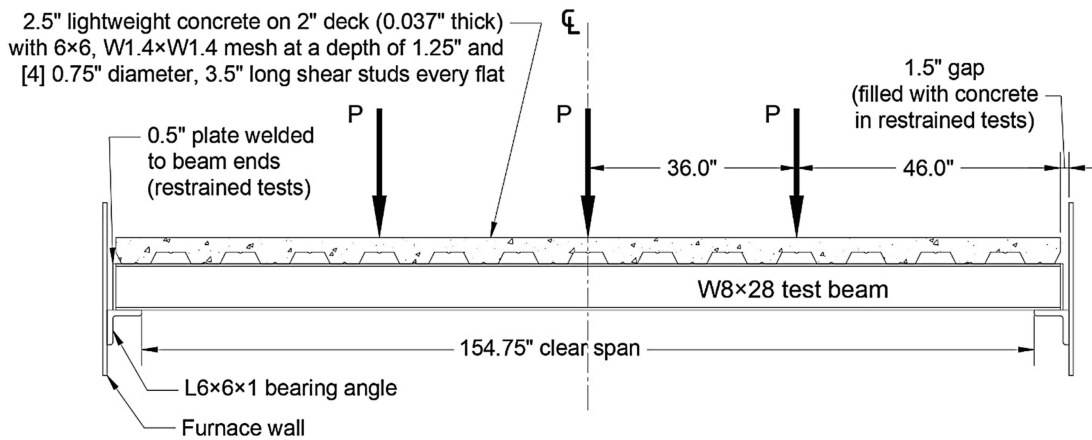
Side view schematic of the floor beam test specimen, support conditions, and applied loading.
